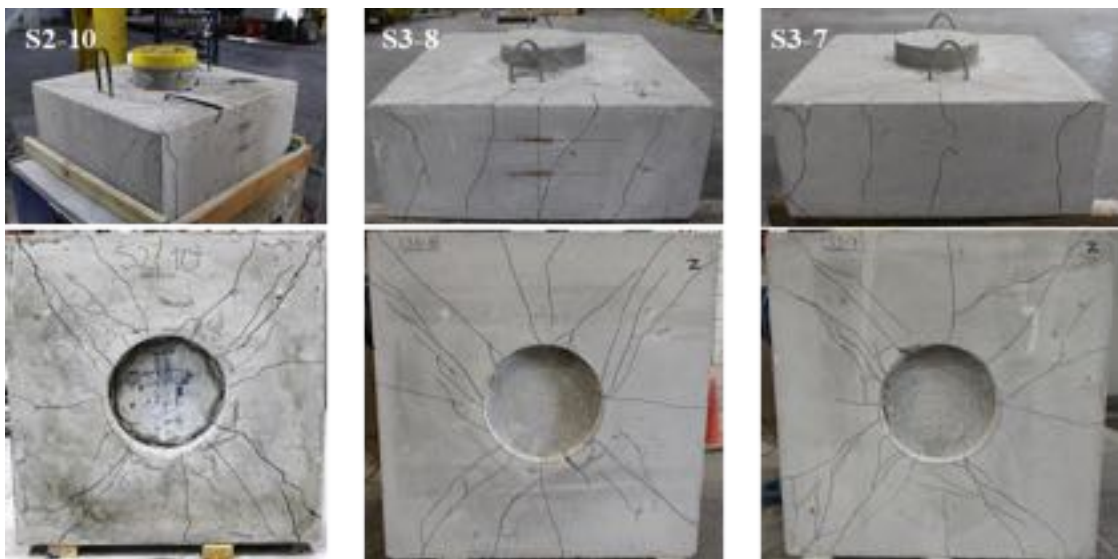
Cracking at failure for (a) S2-10, (b) S3-8, and (c) S3-7
